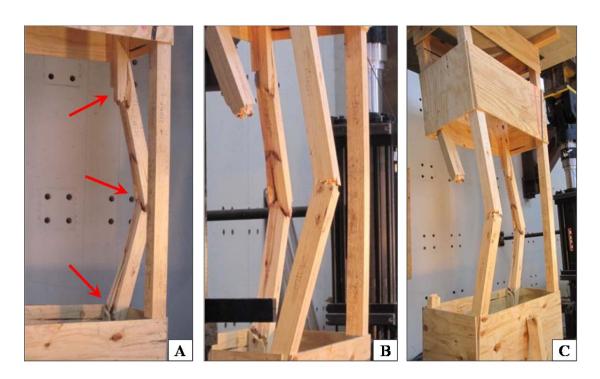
Specimen 2 A) Second Failure B) Third Failure C) End of Test Condition
